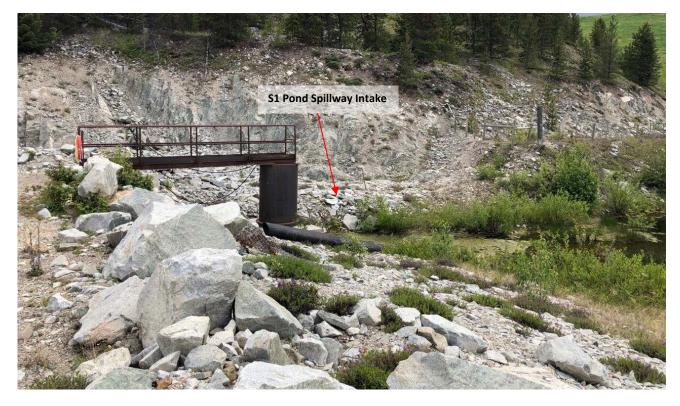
S1 Pond: Overview of upstream slope and Highmont North Dam (HGH-2019-23)
